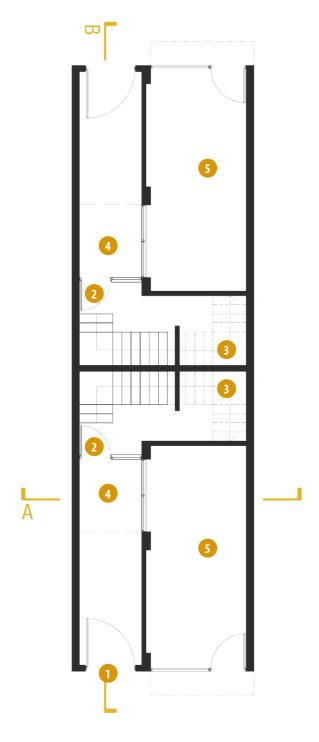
TYPOLOGY D\_GROUND FLOOR PLAN
